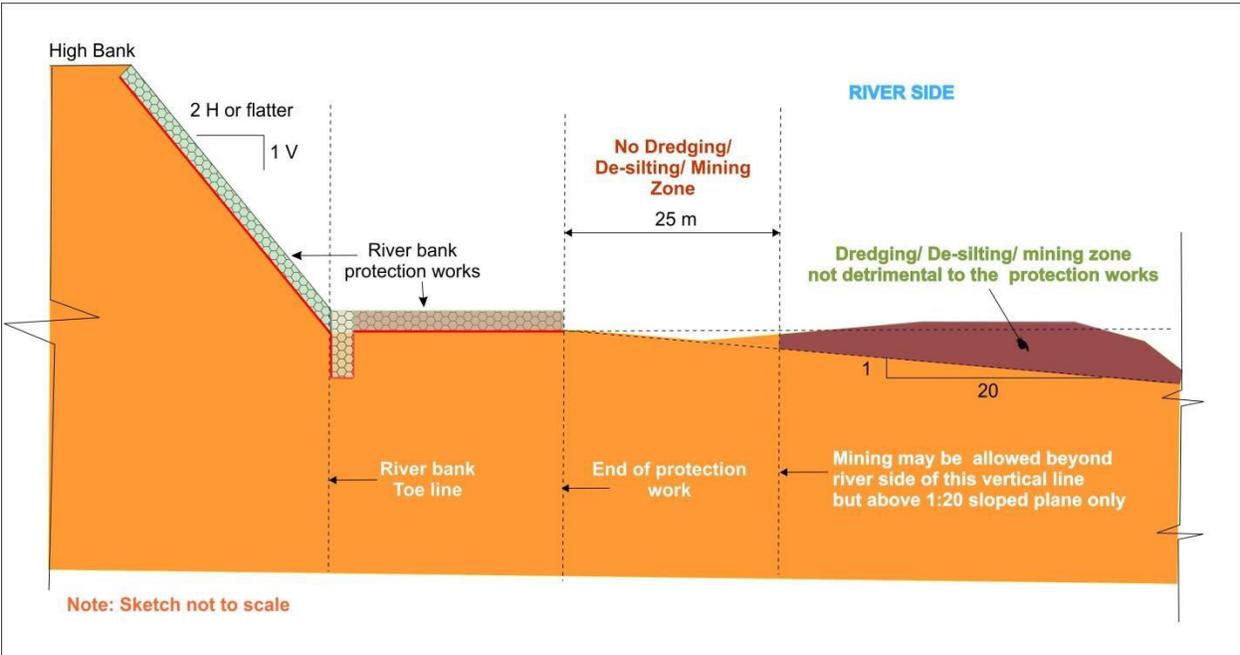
Dredging / De-silting / Mining Restrictions for protecting river bank/ embankment protection works
